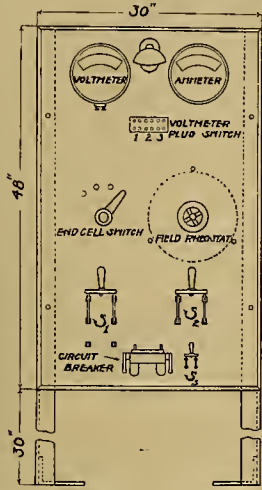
FRONT ELEVATION OF SWITCHBOARD
